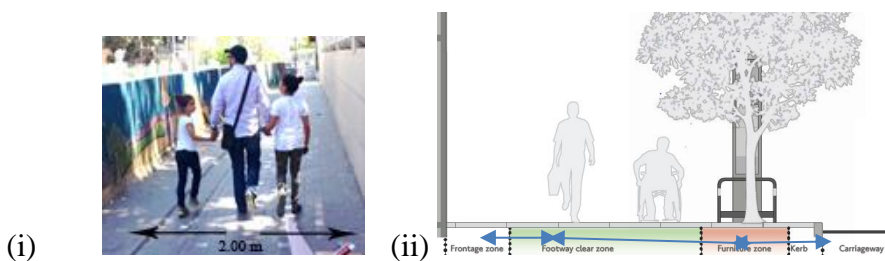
(i) Example of Sidewalk in Rainbow Street; (ii) Sidewalk Divisions
